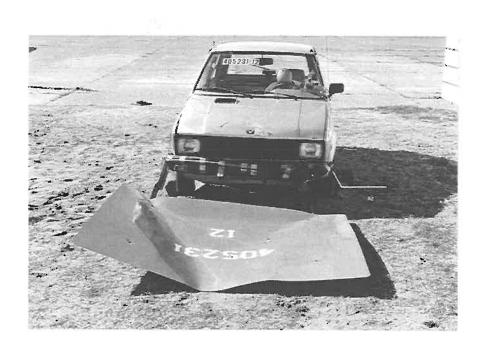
Final rest position of the sign installation and vehicle (test 405231-12).
